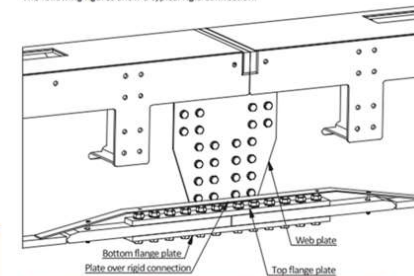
typical rigid connection showing the bolts, flange plates and web plates
